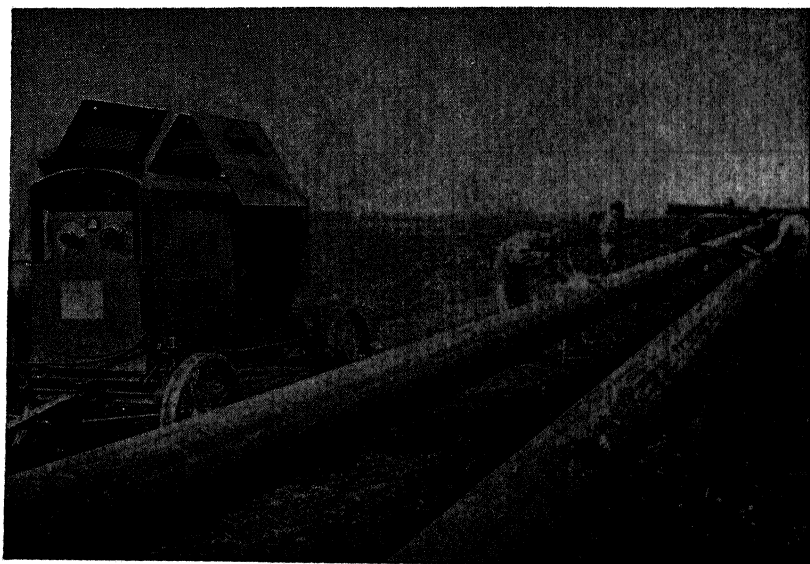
Shield-arc welding a 16-in. gas line (235 miles long) in Nebraska. Roll welds are here being made.
